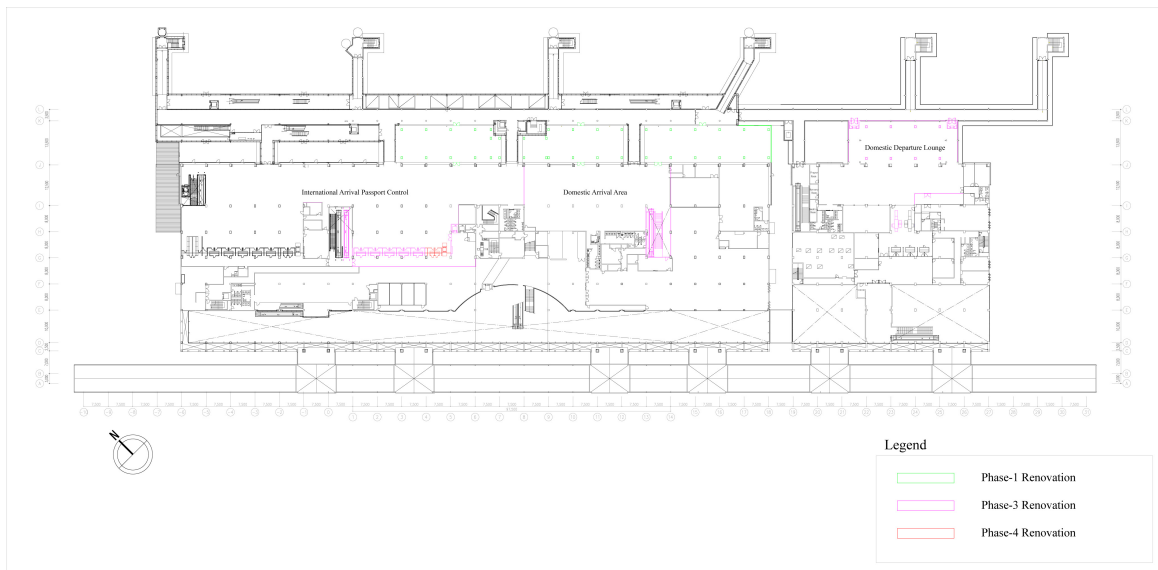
Phase-4 Renovation Plan of Passenger Terminal Building (2nd Floor)
